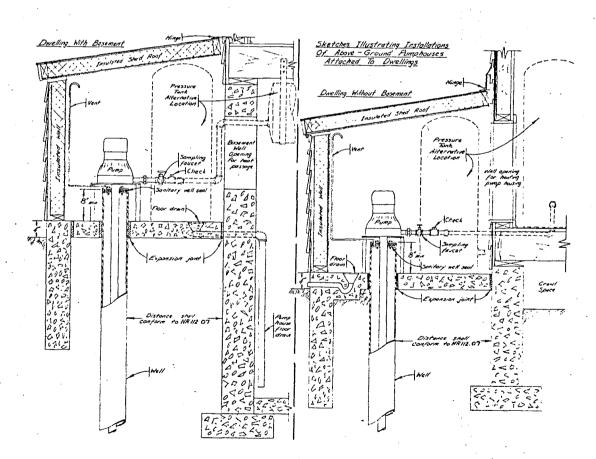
Insulated Pumphouse Adjoining a Dwelling.
